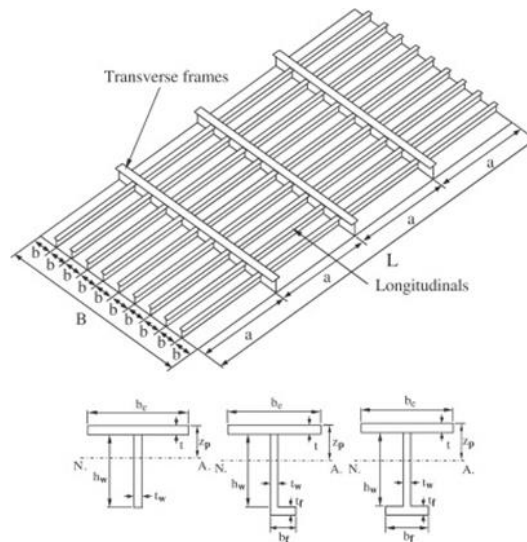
A stiffened plate with longitudinal and transverse support frames (Paik et al., 2008a)
